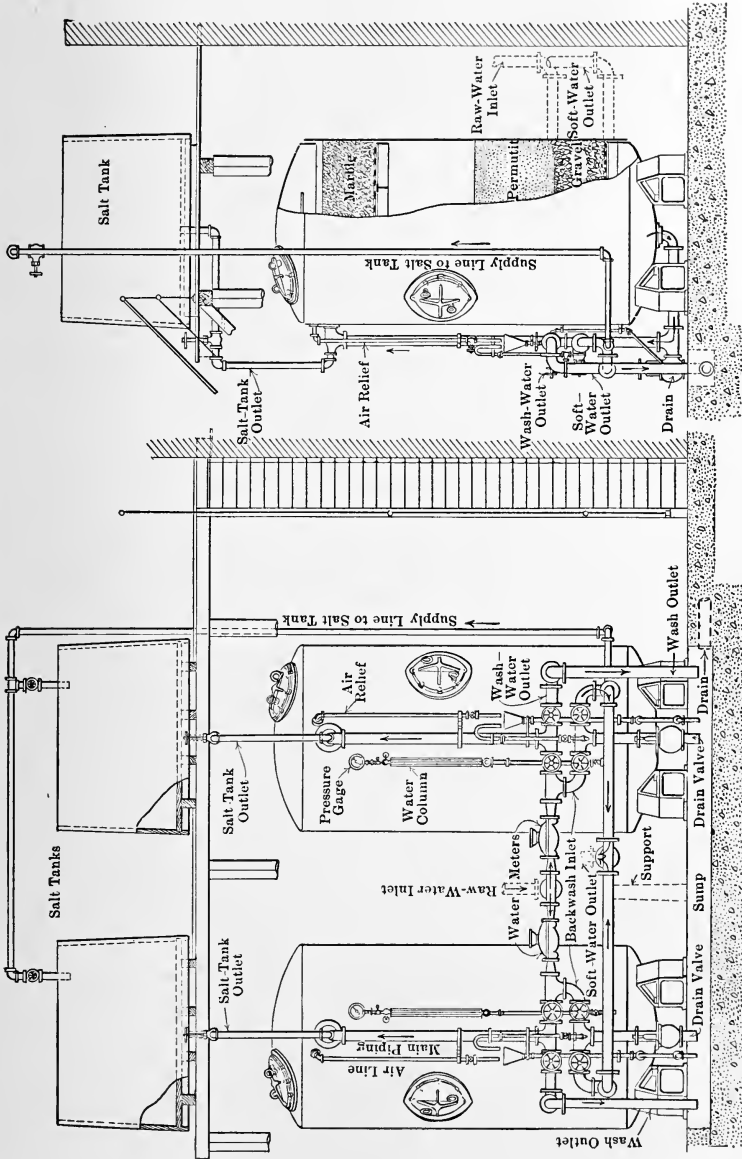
Side Elevation and End-sectional Elevation of a Permutit Water-softening Plant.
